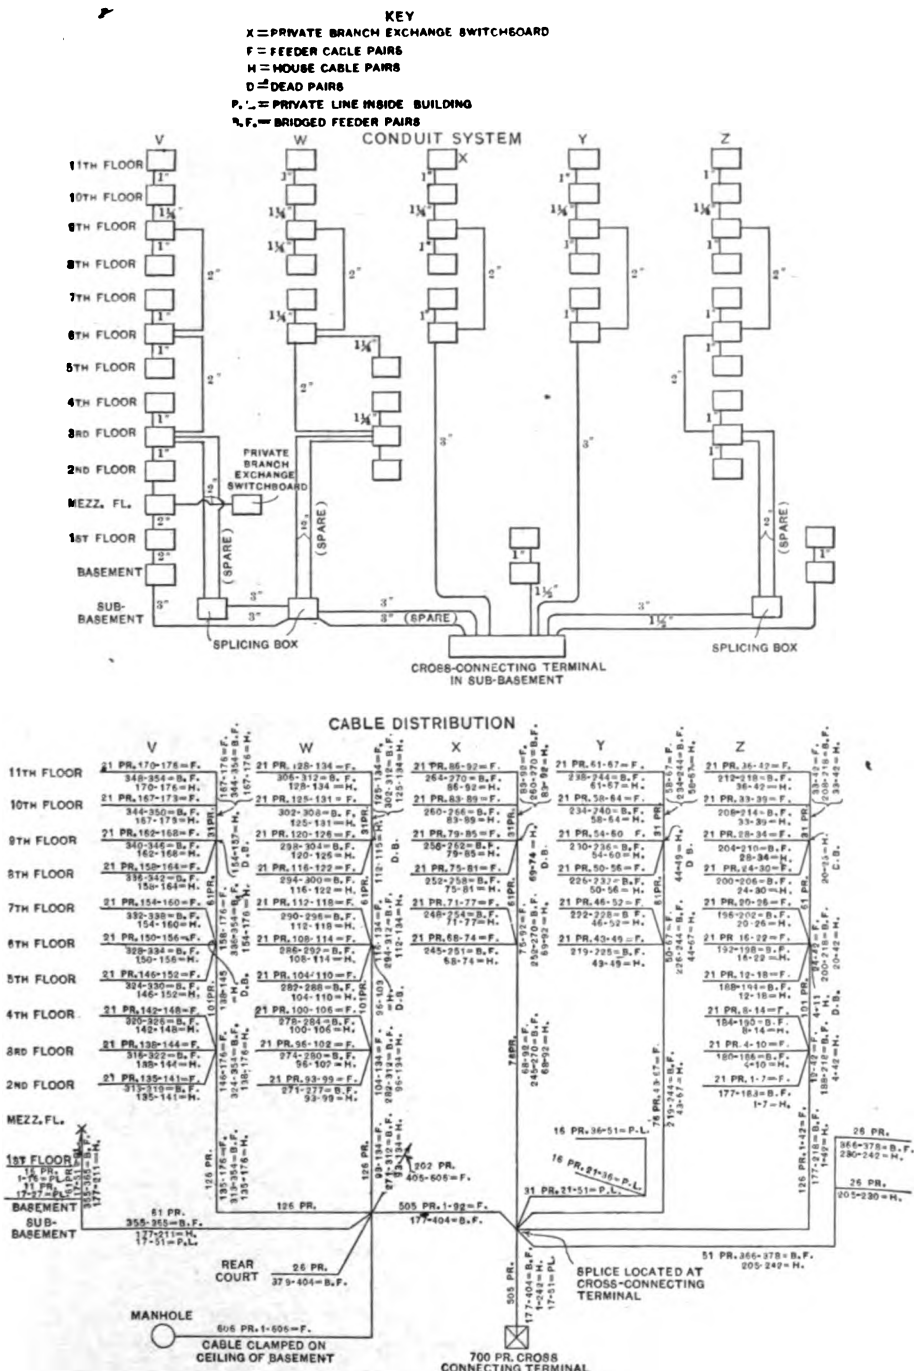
11-STORY OFFICE BUILDING, CONDUIT SYSTEM AND CABLE DISTRIBUTION.
